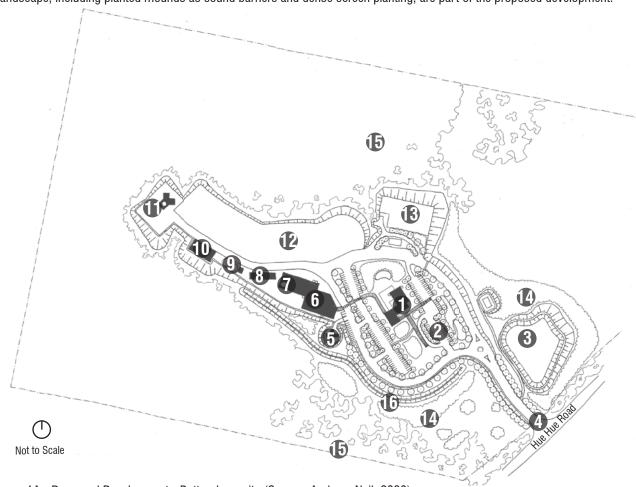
A - Proposed Development - Buttonderry site (Source: AndrewsNeil, 2008)
